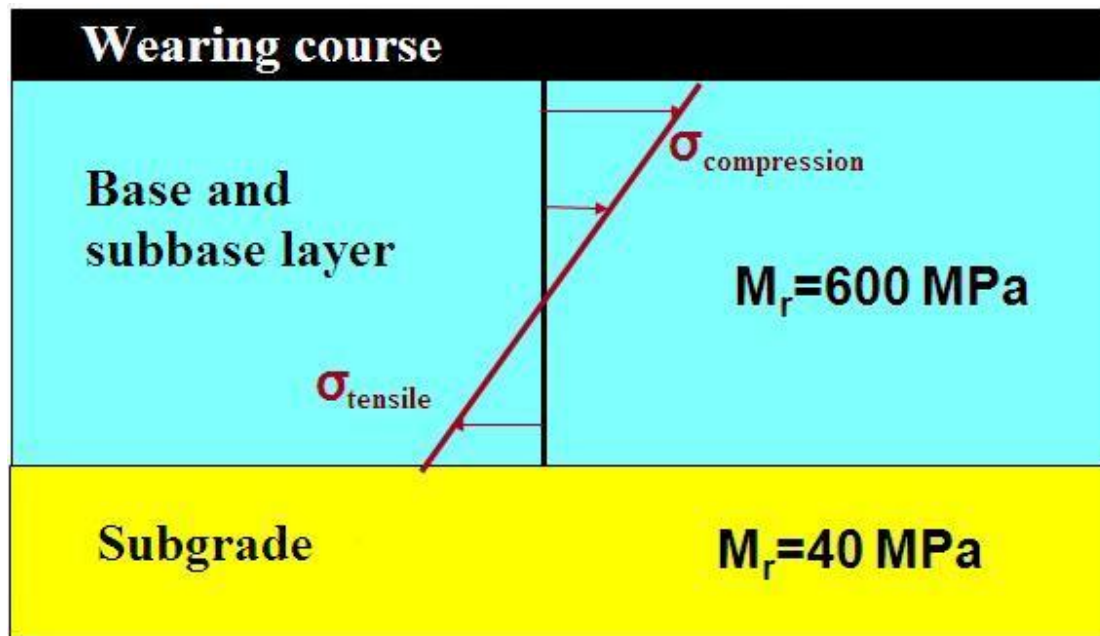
Stresses occurring in the pavement construction (Huvstig 2009)
